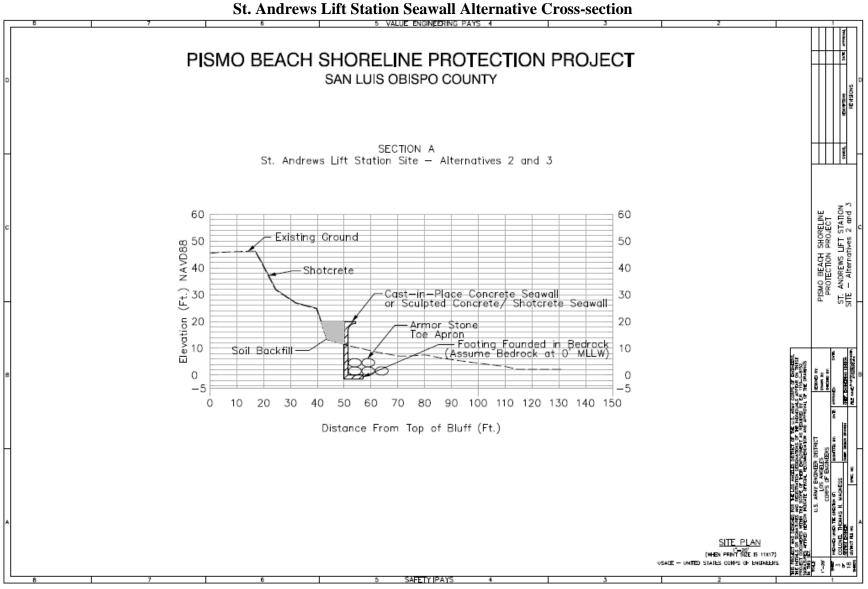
St. Andrews Lift Station Seawall Alternative Cross-section
